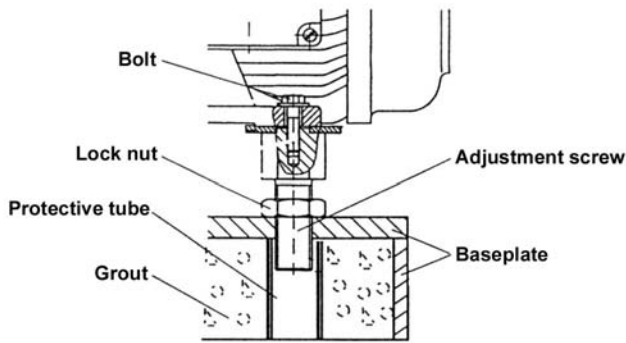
Grouting inside the baseplates of adjusting screw type
